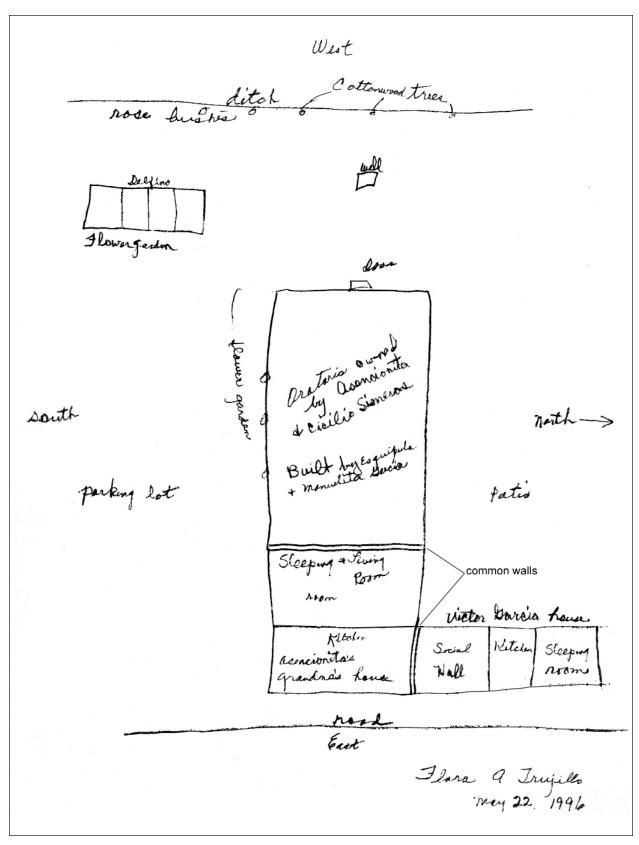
Adaptation of Flora Trujillo's 1996 sketch plan of the García-Sisneros house and oratorio at Gavilan.
